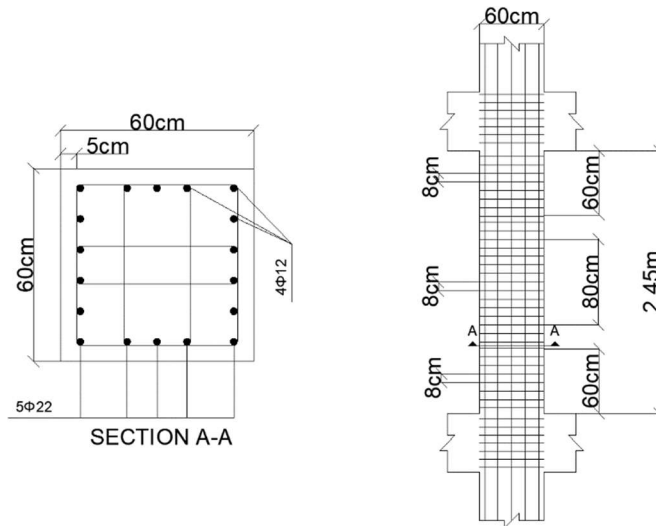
The section and reinforcement detailing of Type 1 column in the design
